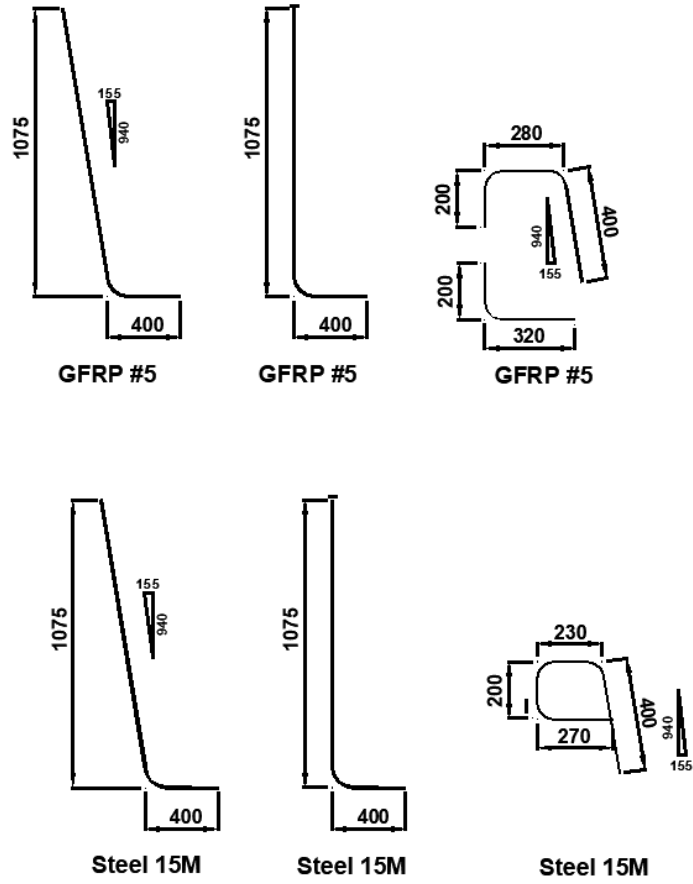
Barrier wall reinforcement layout. All dimensions in mm.
